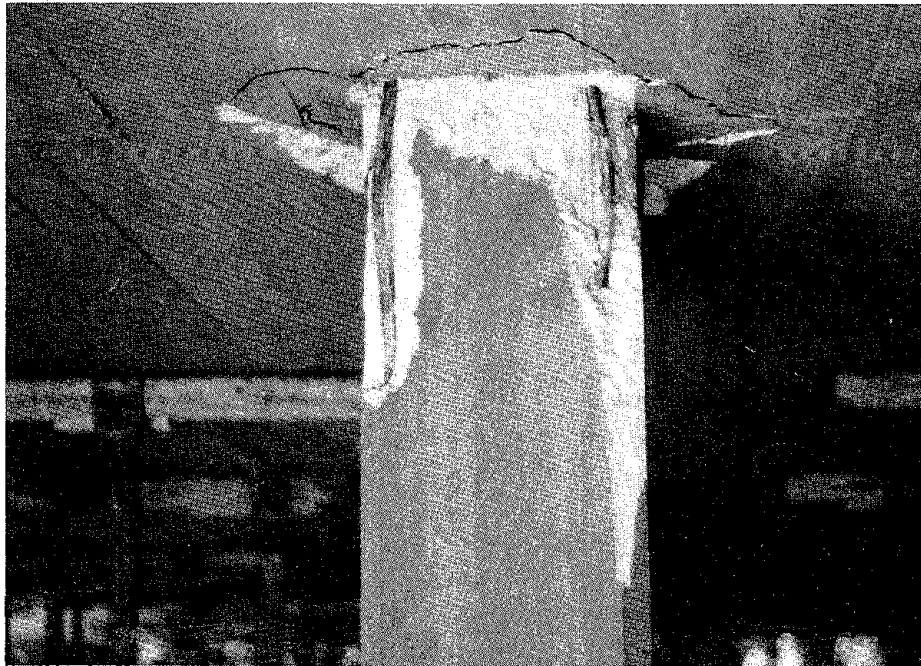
Typical damage of column-to-slab connections. This shows detail of damage to the building on the left in Figure 4.17.
